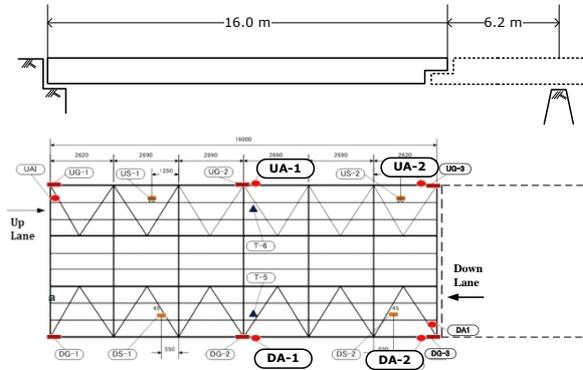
Elevation and plan views with sensor deployment of the observation bridge.
